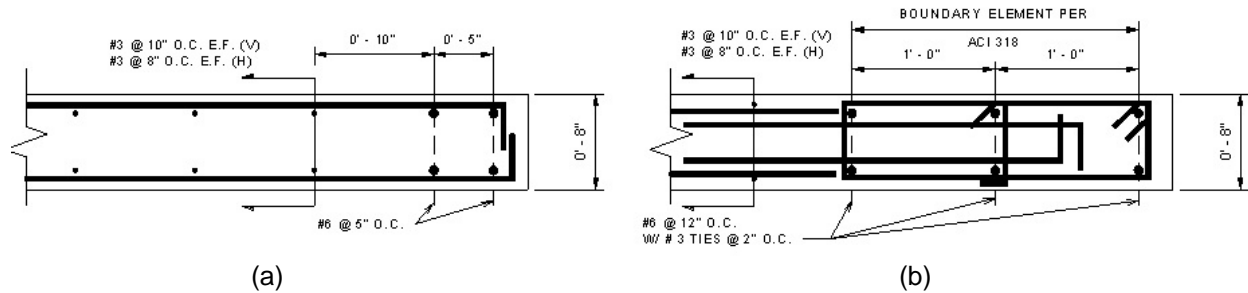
Shear wall boundary element detailing for the case study building: (a) Chilean detailing; and (b) ACI 318 detailing for confinement.
